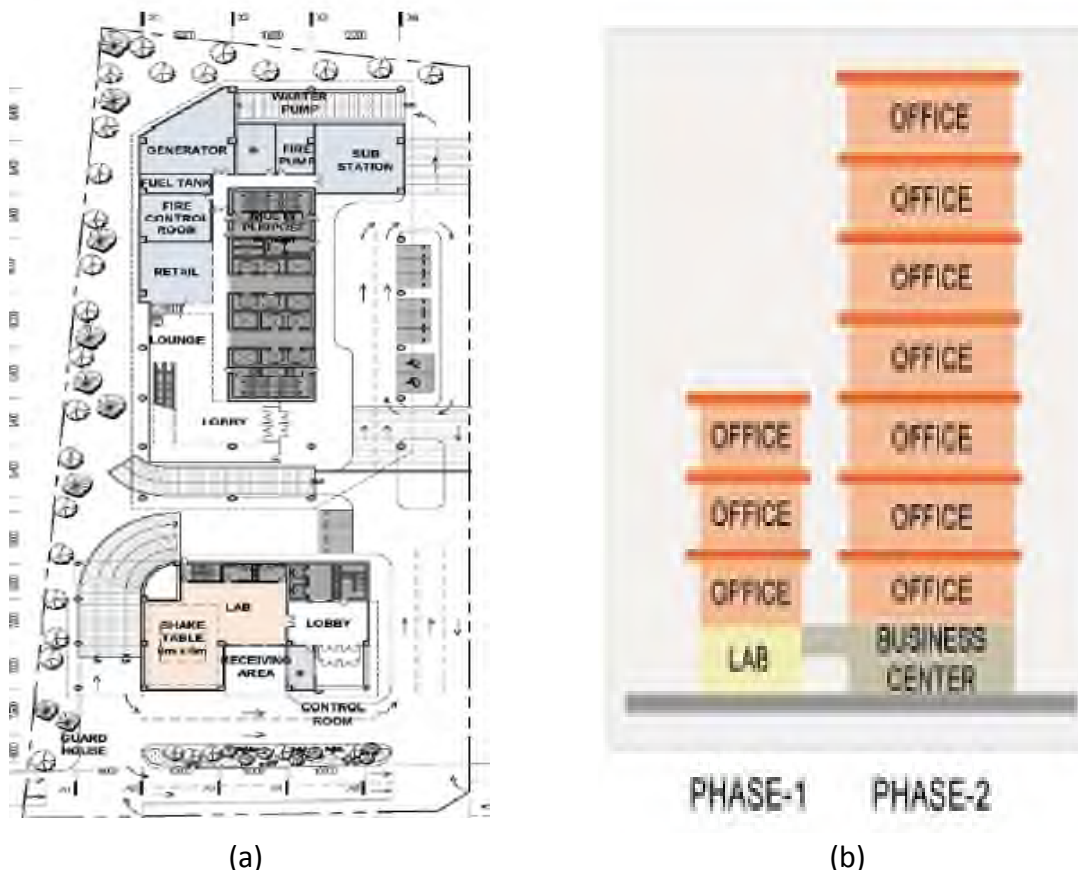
(a) Schematics of Floor plan and (b) Elevation of finalized RAJUK-URU Building
